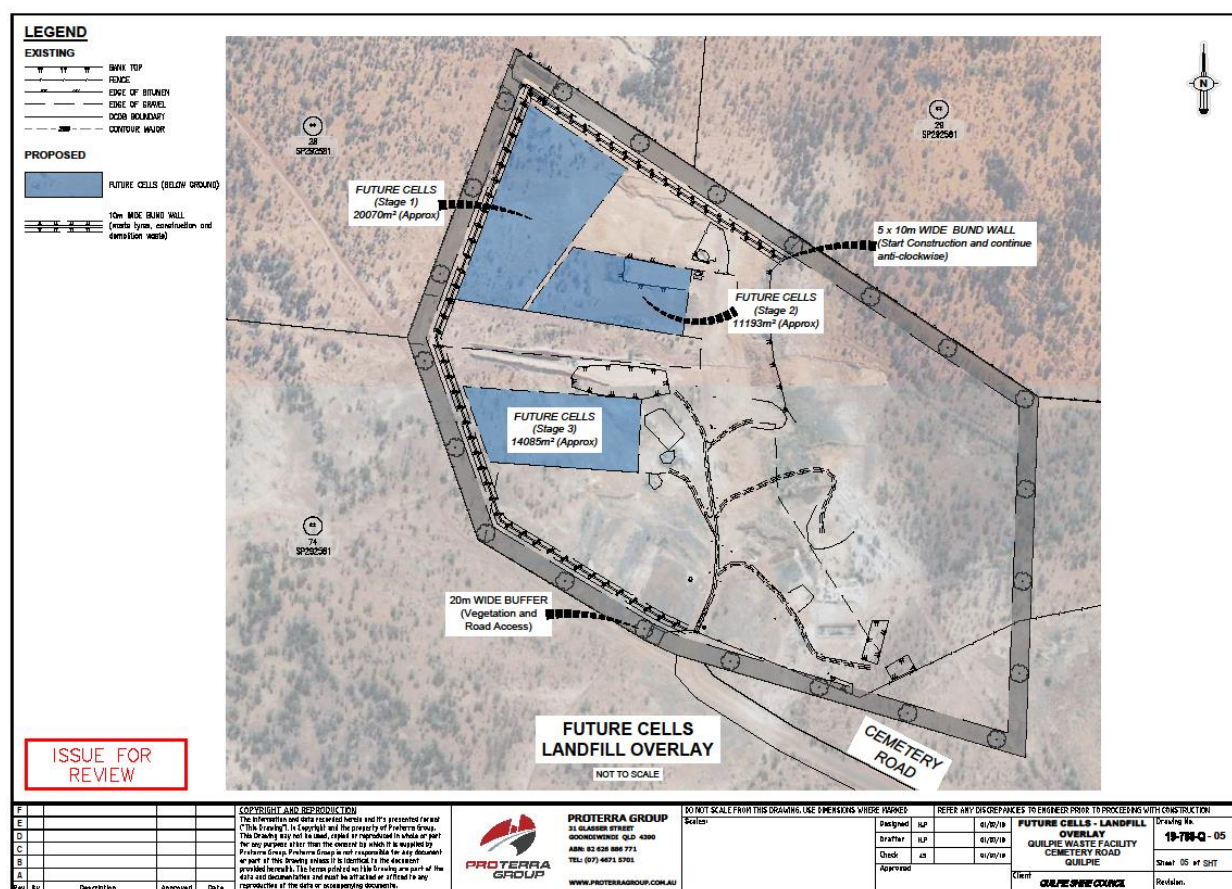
Quilpie Waste Facility – Proposed Future Landfilling Areas
